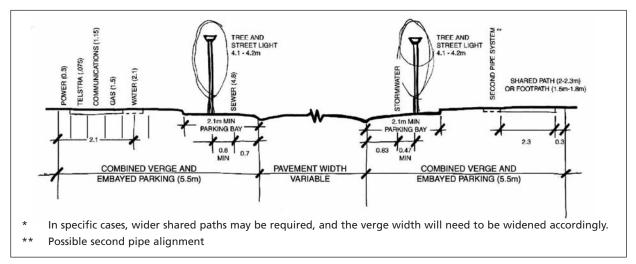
Typical services, tree and path locations in 5.5 m verge incorporating indented parking.
